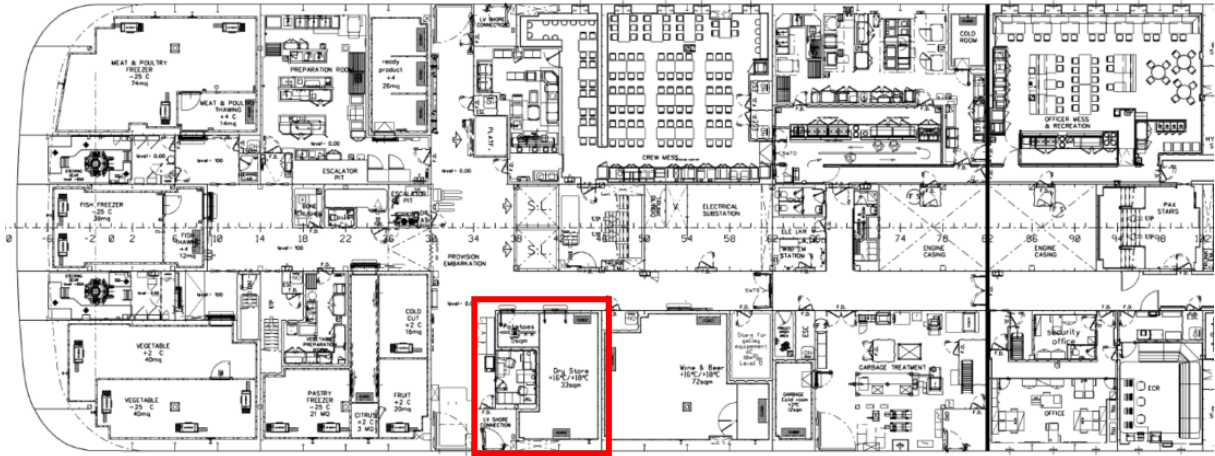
Plan view of the Deck A of the cruise ship, showing the location of the space to be refitted for SSE equipment installation
